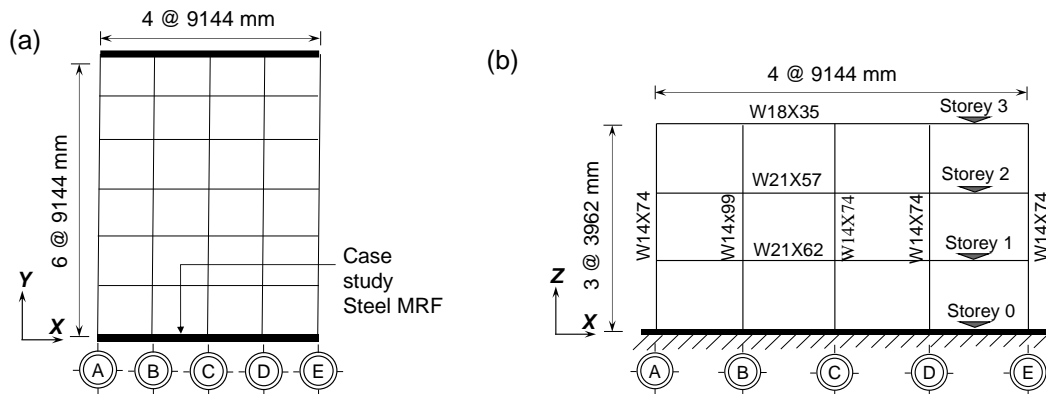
Case-study steel moment-resisting frame (MRF): (a) Plan view; (b) Elevation view.
